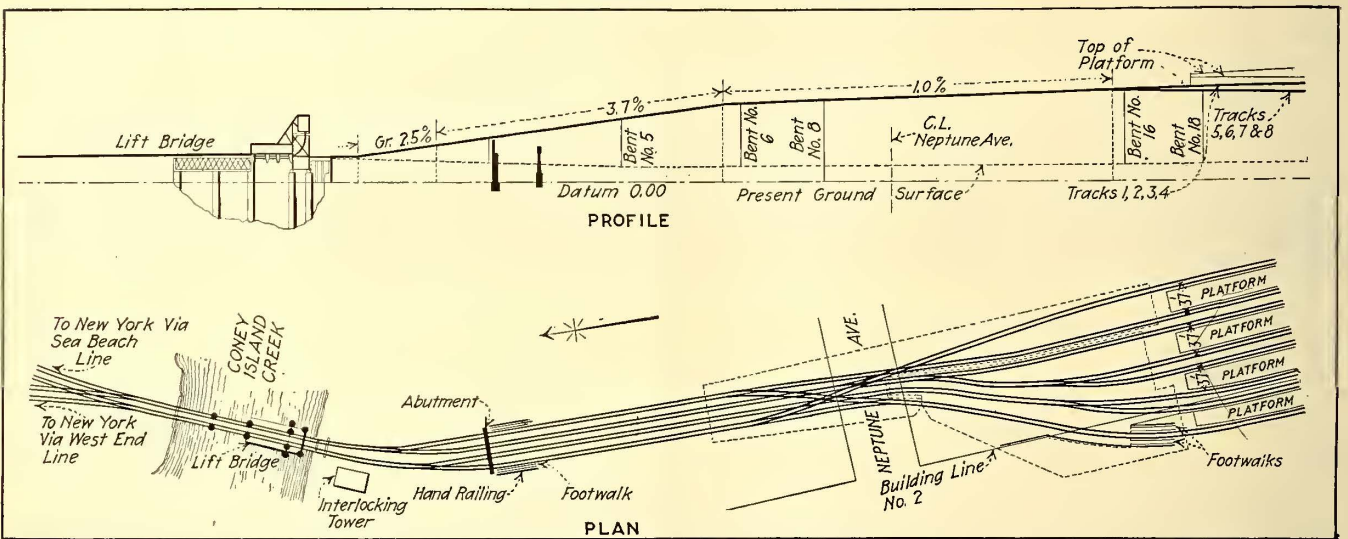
TRACK PLAN SHOWING COMPLICATED SPECIAL WORK AT THE NORTH OF STILLWELL AVENUE TERMINAL
